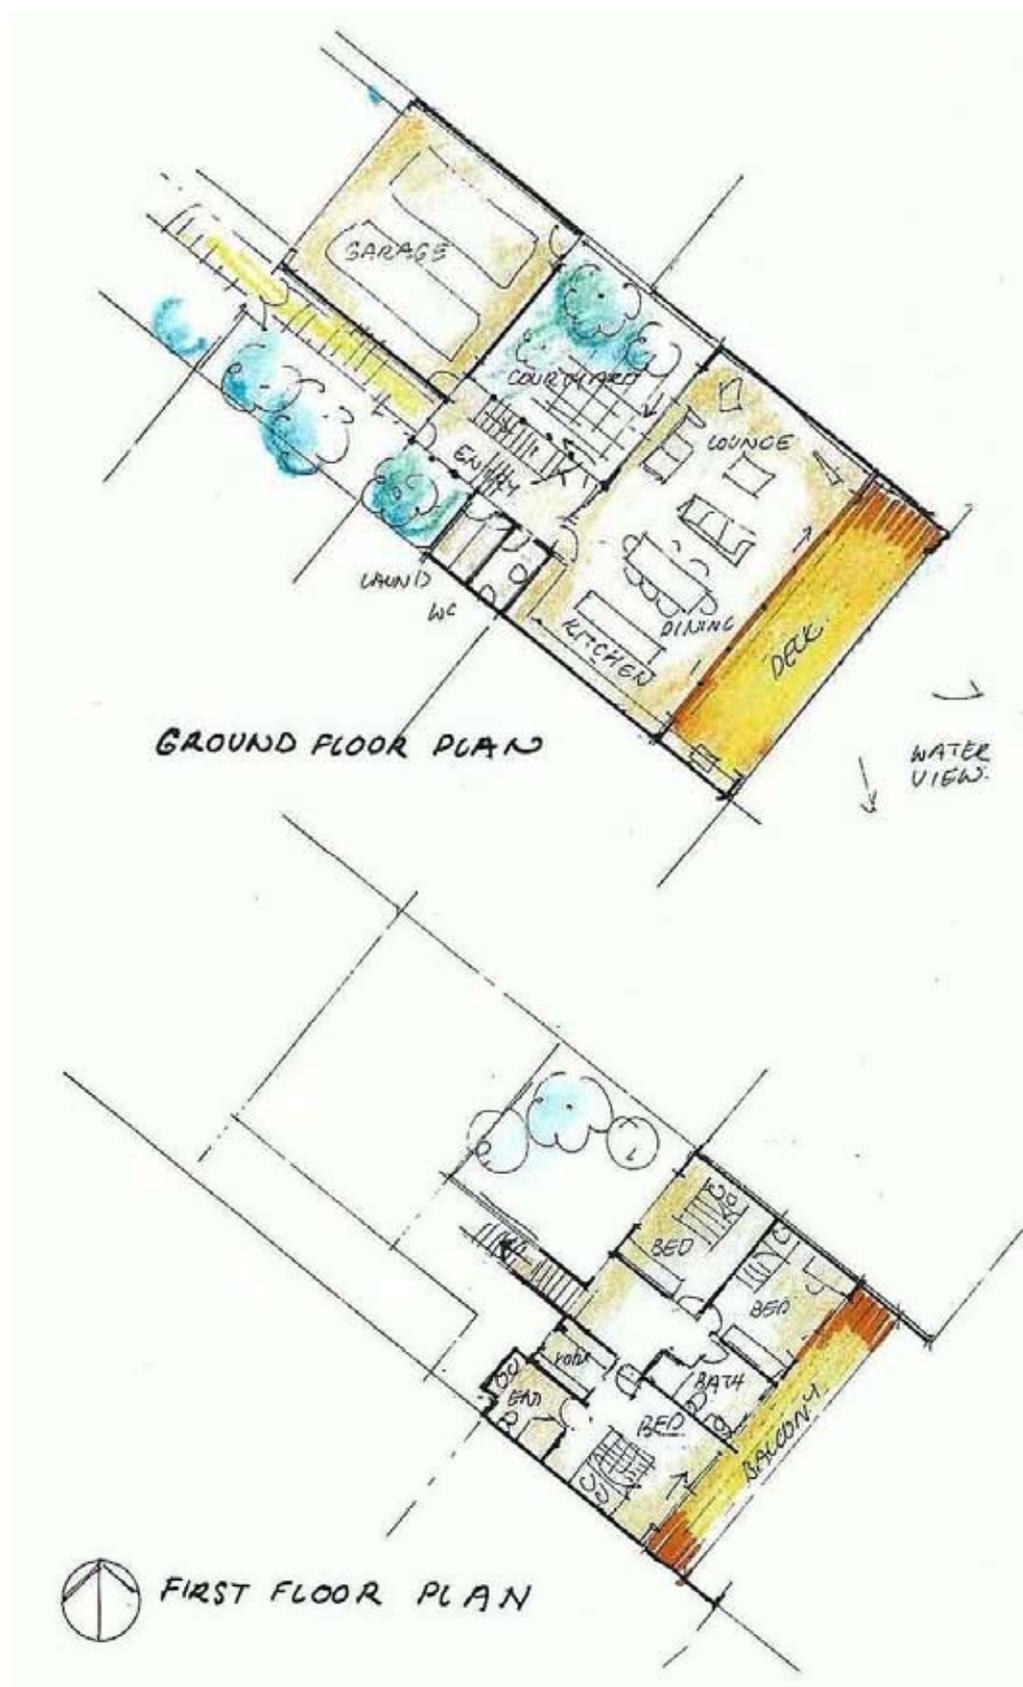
Northern villa waterfront, typical floor plan (1)
